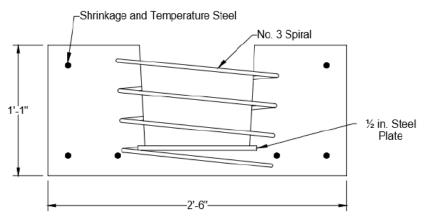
Designed reinforced concrete confinement block schematic (Nemiroff 2016)
